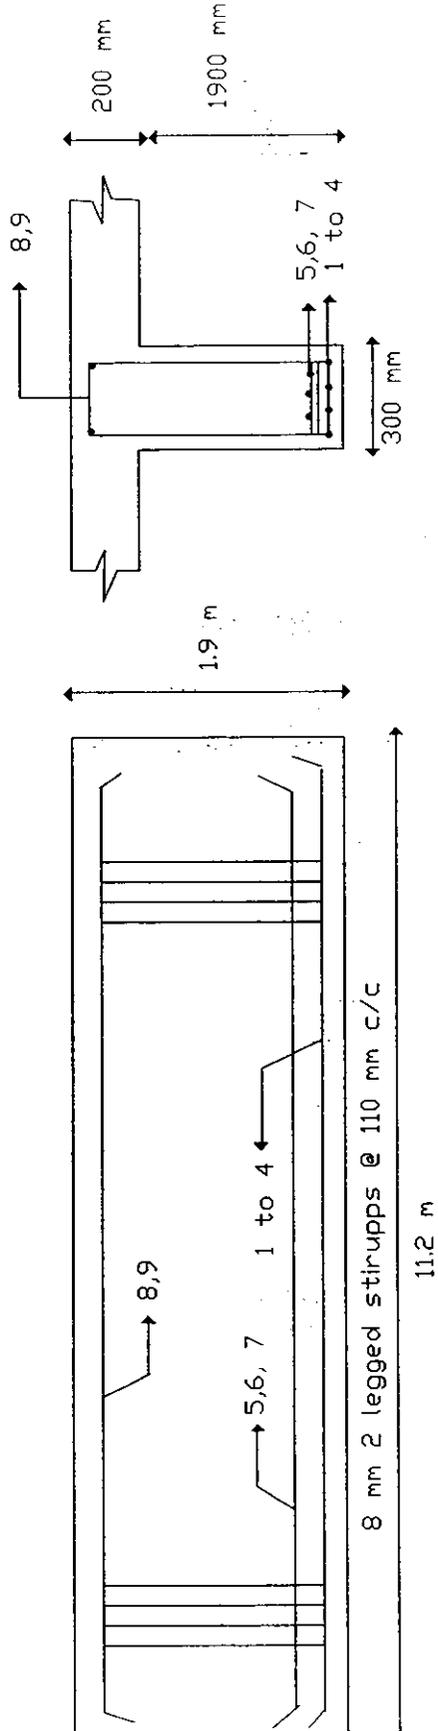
REINFORCEMENT DETAILS FOR CROSS BEAM
